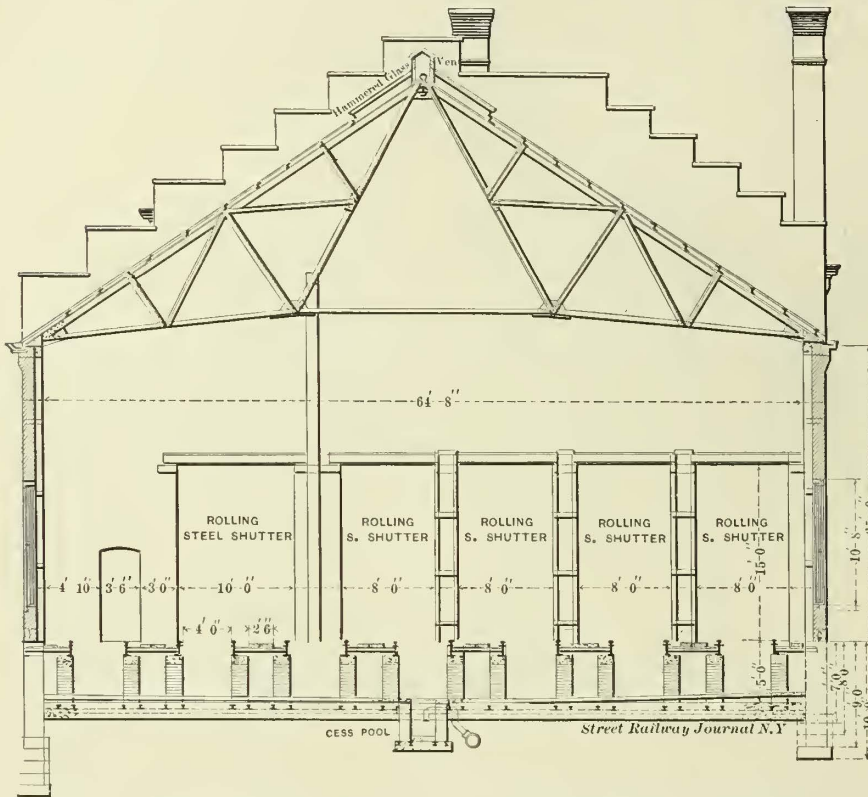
CROSS SECTION THROUGH CAR SHED, PEOPLE'S STREET RAILWAY.
